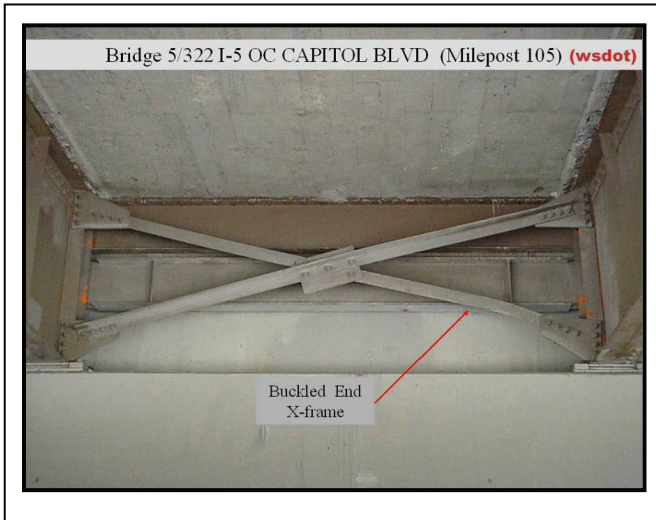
Minor Damage: Buckled Bracing Element (WSDOT)
